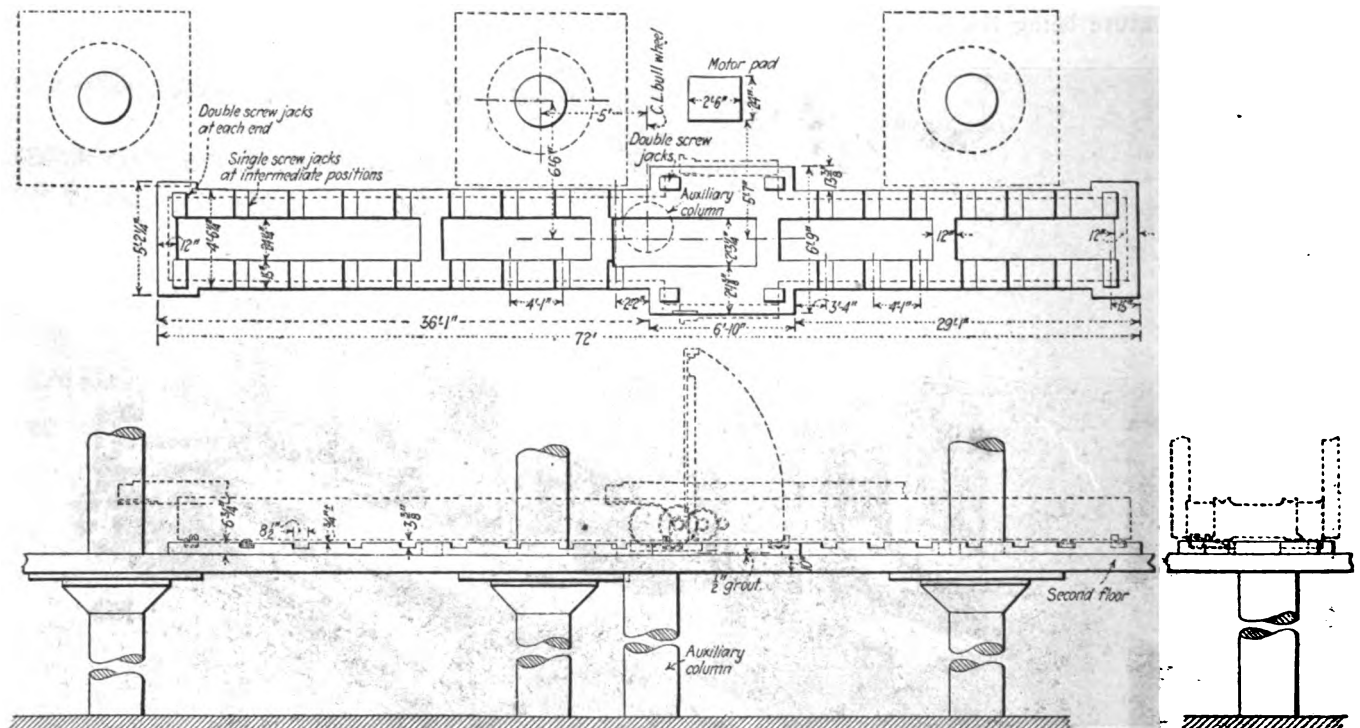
FOUNDATION AND SUPPORTING COLUMNS
